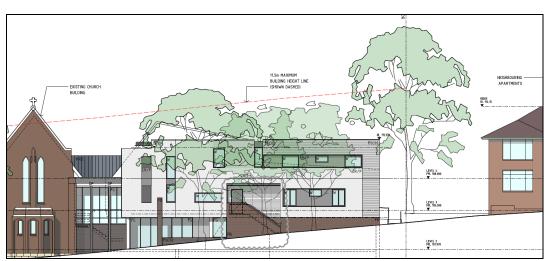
Hill Street elevation showing height of proposed building and existing residential flat building. The 11.5m height limit is shown as a dashed line.
